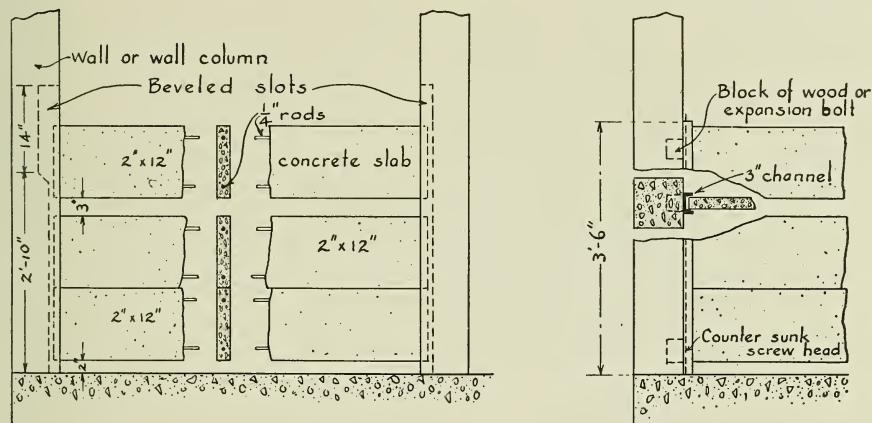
Concrete Slab Partition, made of 2 by 12-inch slabs, which fit into slots cast in the walls, or 3-inch channel iron screwed to wood blocks or wall plugs.
